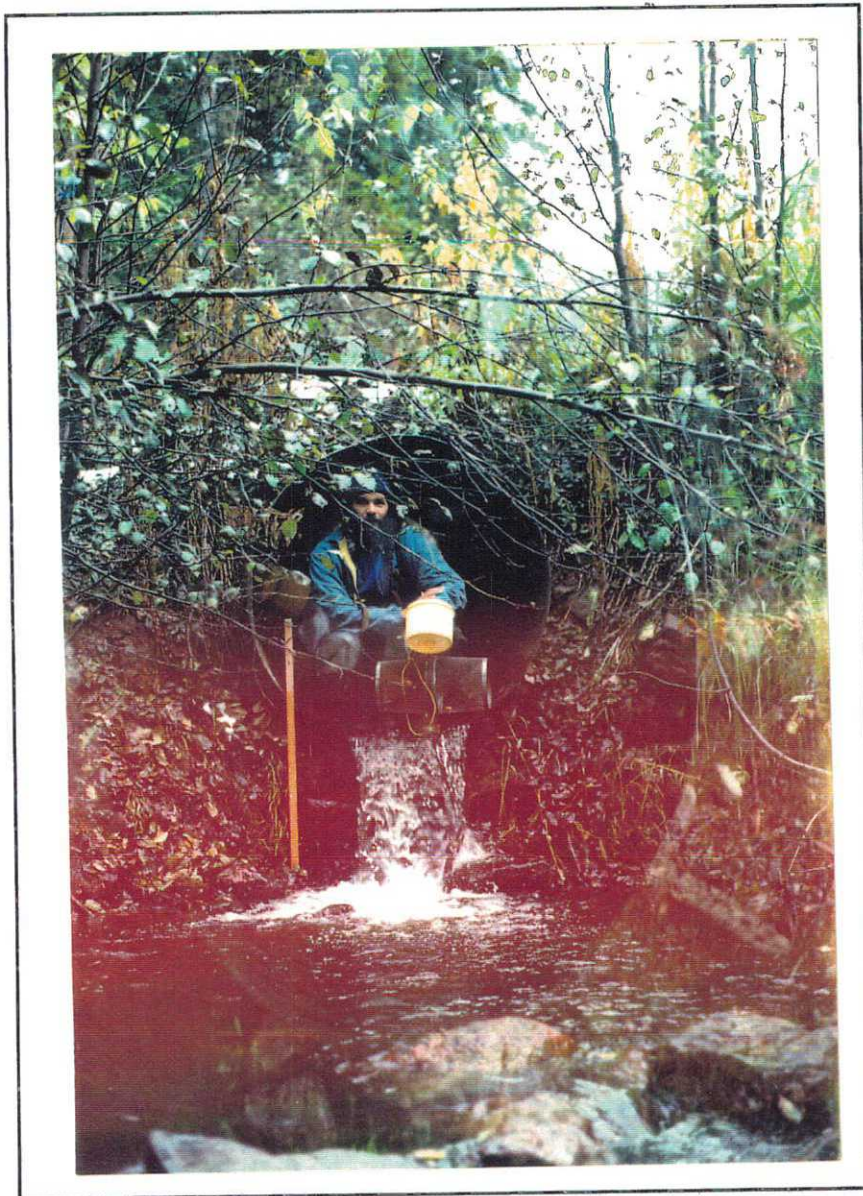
Trib 700-050-20-60 (49.3 km) Upper Fulton FSR. Culvert obstructs fish passage. Gravid dolly varden were gee-trapped up to this crossing, but not above. Fall/1995.
